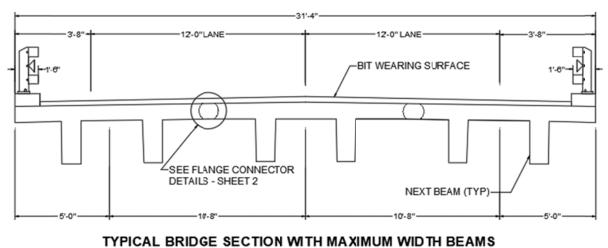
Compete Beam Flange Serves as Deck with Overlay (Redrawn from High Bridge Team 2016).
